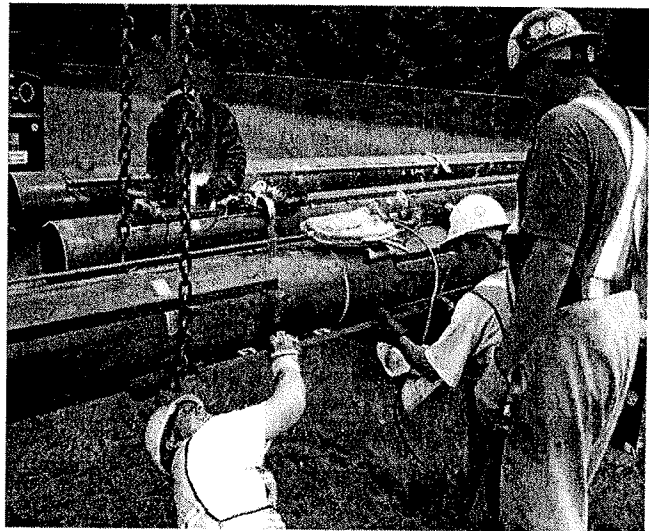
Welding of the instrumented segments of the test piles before driving.
